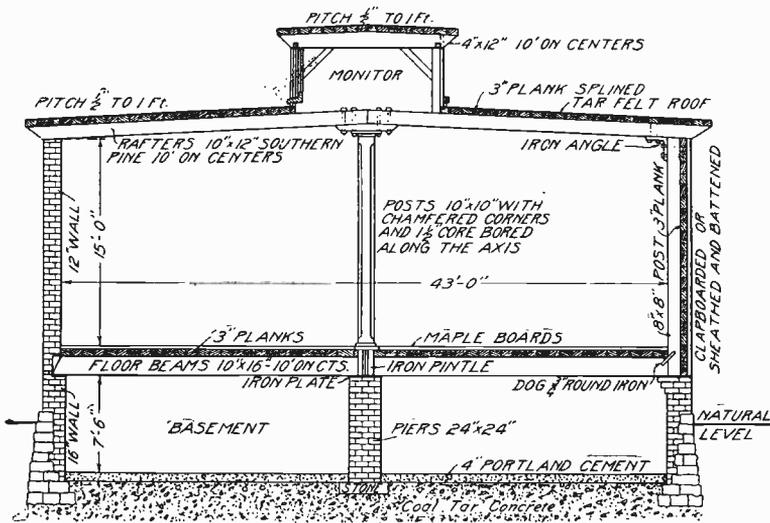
Standard Construction for Lighting Station. Brick and Wood Construction
